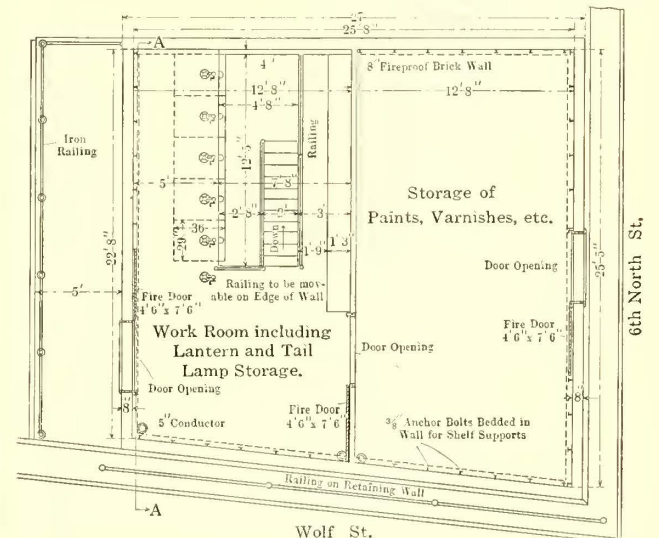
Syracuse Shops—Plan of Second Floor of Paint and Oil House
